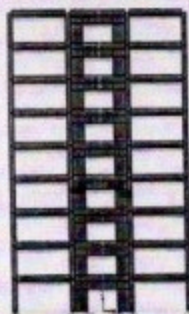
(a): Elevation of shear wall with openings in high rise structure.
